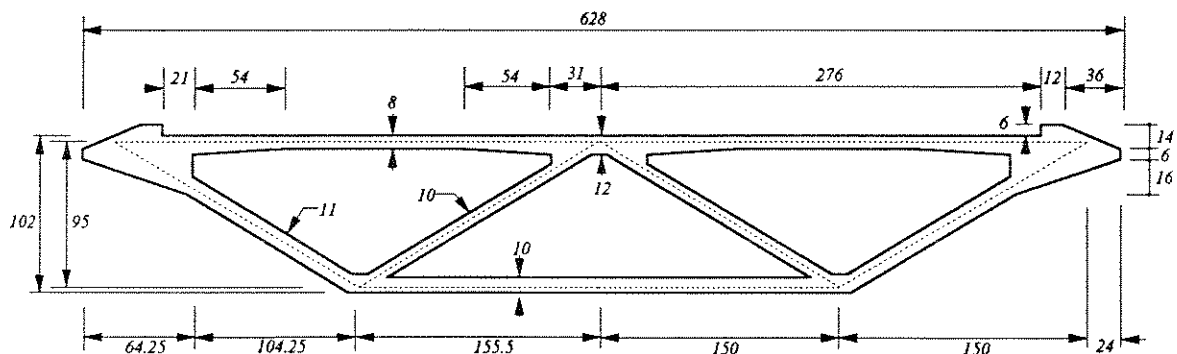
DECK PLAN; RUCK-A-CHUCKY CONCRETE BRIDGE
